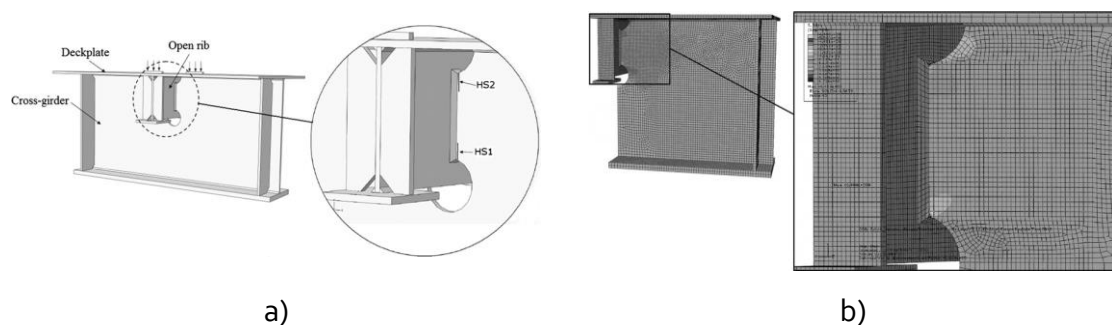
Welded detail investigated by Aygül [75]: a) Fatigue test specimen loading and investigated hot spot points; b) solid element model with an element size of 4 mm.
